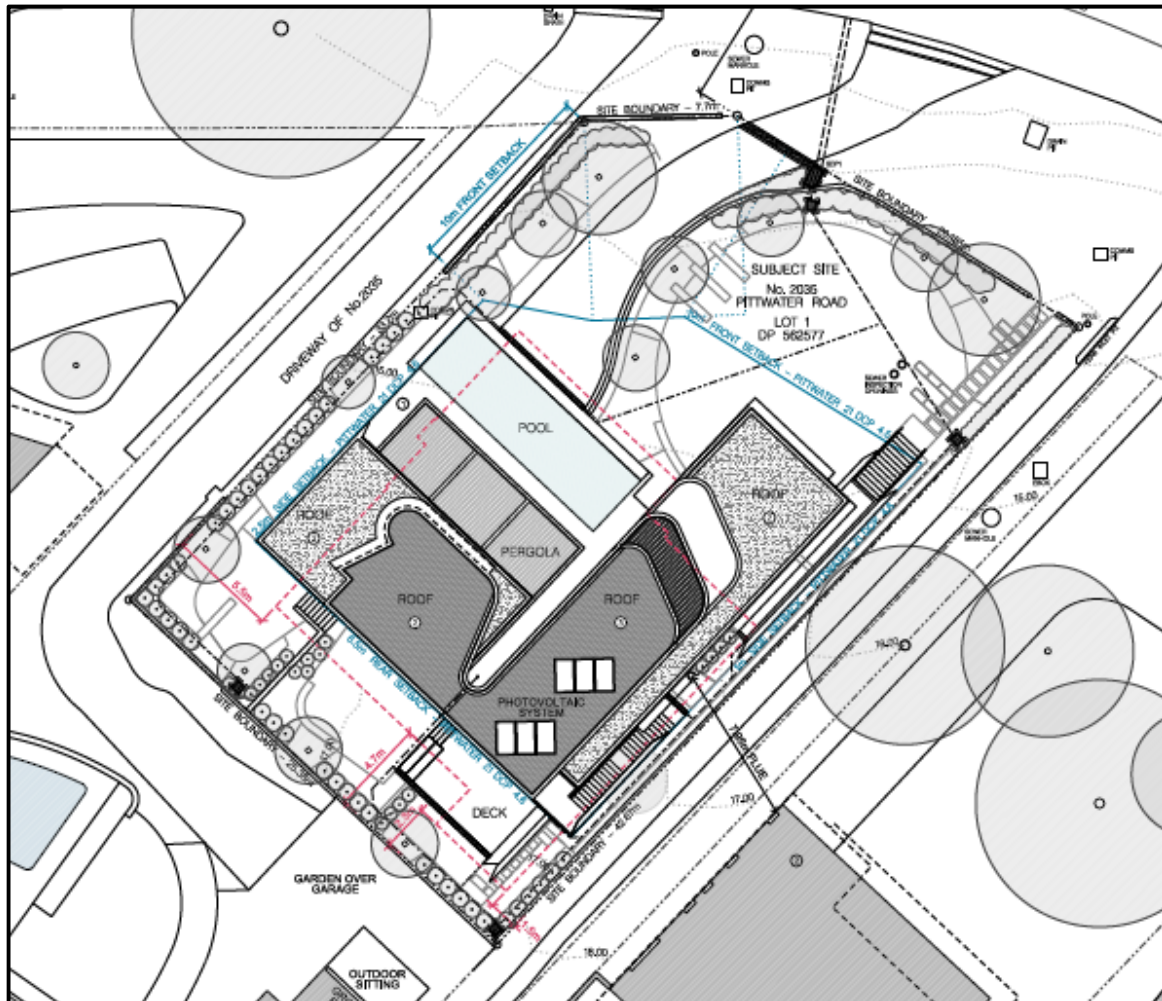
Site Plan (Source: Aaron Vumbaca Pty Ltd, Drawing No. DA-1002)
